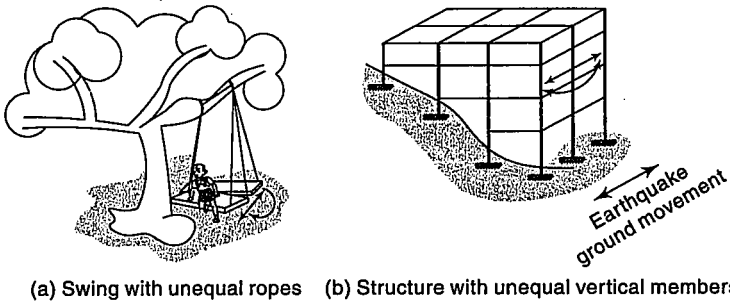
Torsional vibration of a structure with uneven vertical members loaded unequally in plan (Murthy 2005)
